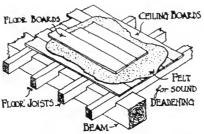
This illustration of an open timber floor is referred to on the opposite page. Wider and shallower timbers than usual should be used to construct these floors, in order to give an effect of strength when viewed from below.
